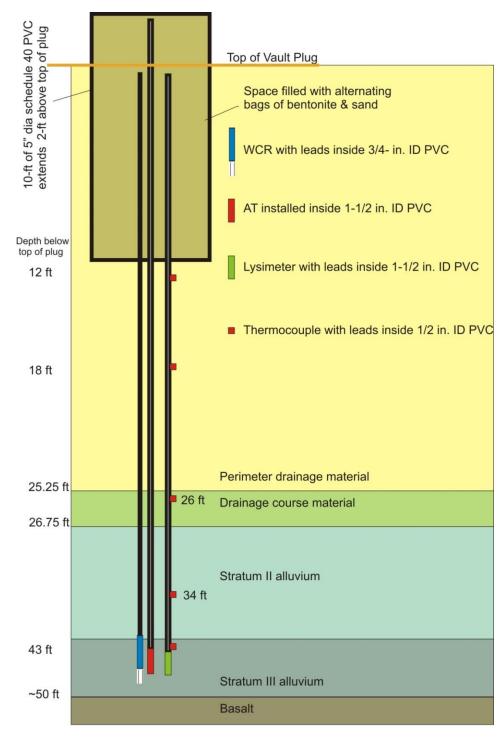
Vertical section showing instrument locations in the PA-45 drilled borehole.
